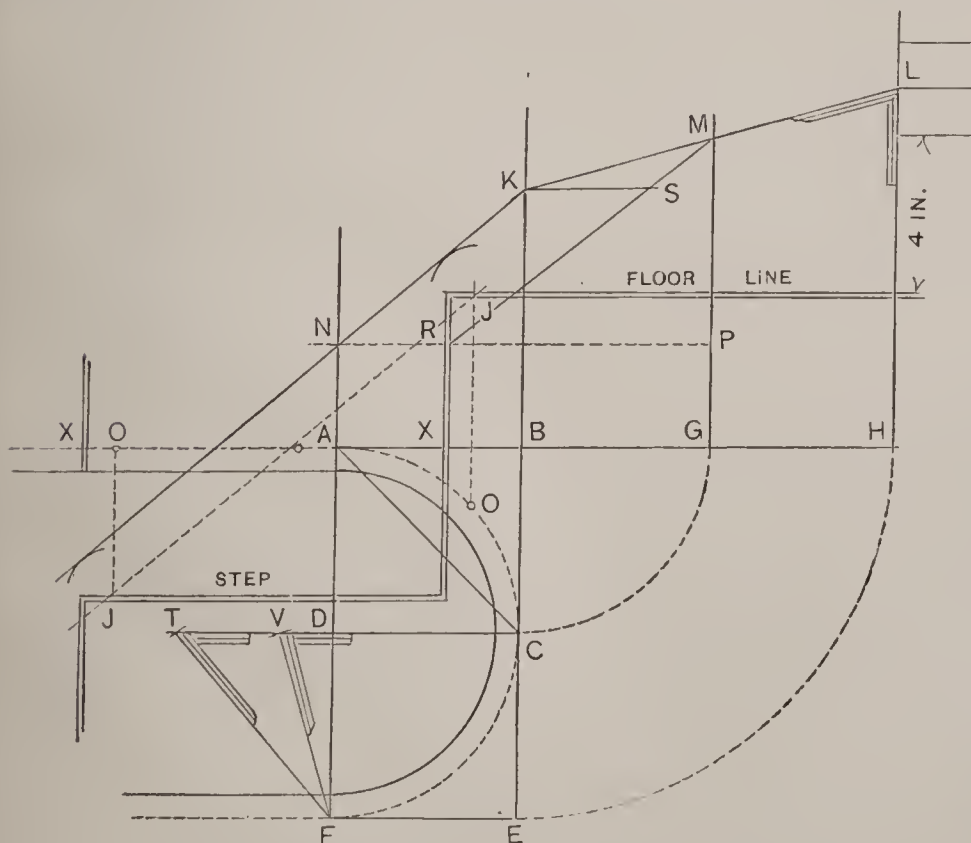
PLAN OF 8-INCH CYLINDER STAIRS.
